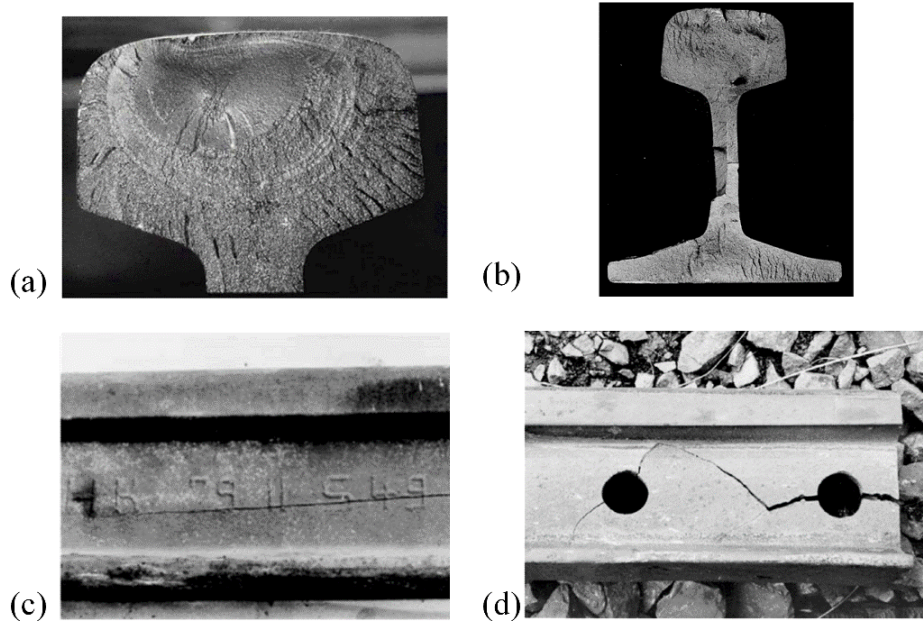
(a) Rail fracture caused by the kidney-shaped crack [4]; (b) longitudinal vertical web crack; (c) horizontal web crack; (d) rail web cracks occurring at fishbolt holes [25].
